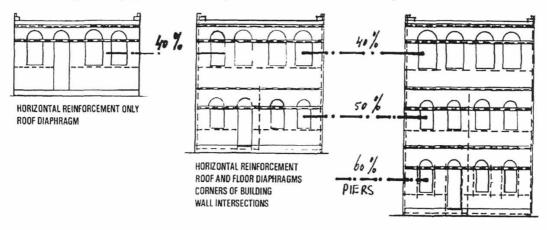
MINIMUM PERCENTAGE OF WALL SECTIONS AND PIERS REQUIRED FOR LOW BUILDINGS
